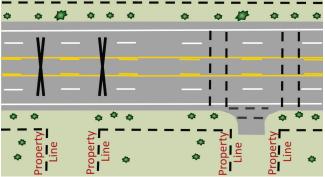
Planned Roadways – Unimproved versus Portion Improved for Vehicular Travel
